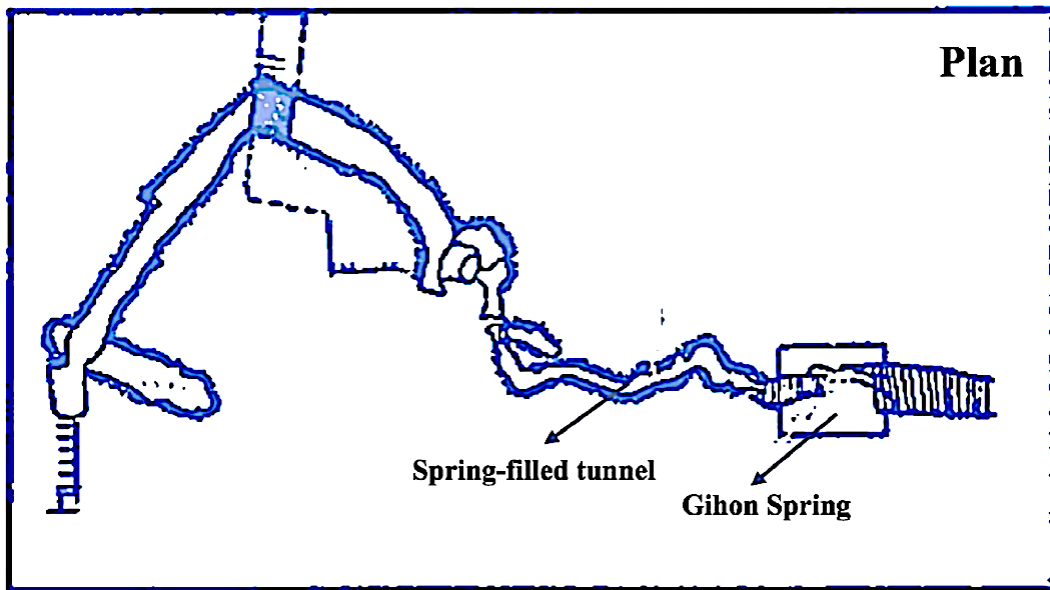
Plan of Jebusite water system (adapted from Cole 1980)
